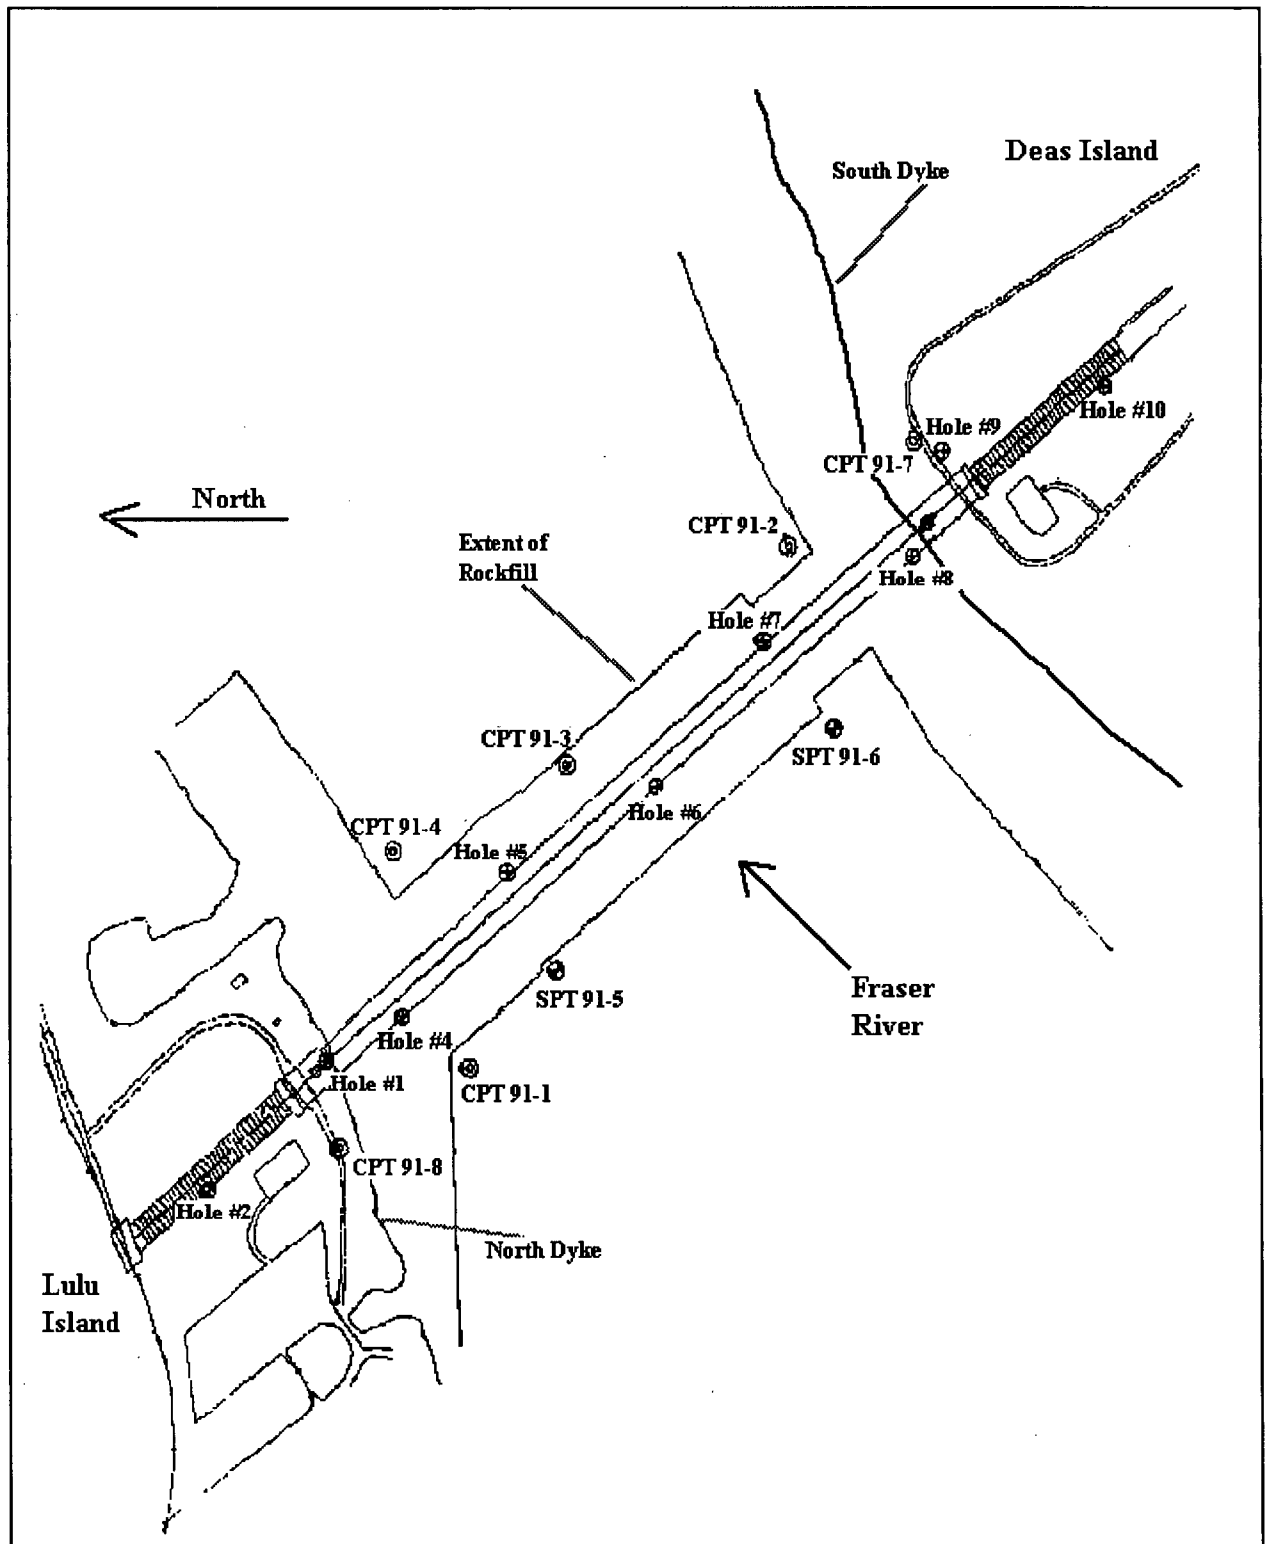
Plan View of Cone Penetration Test and Preconstruction Borehole Locations
